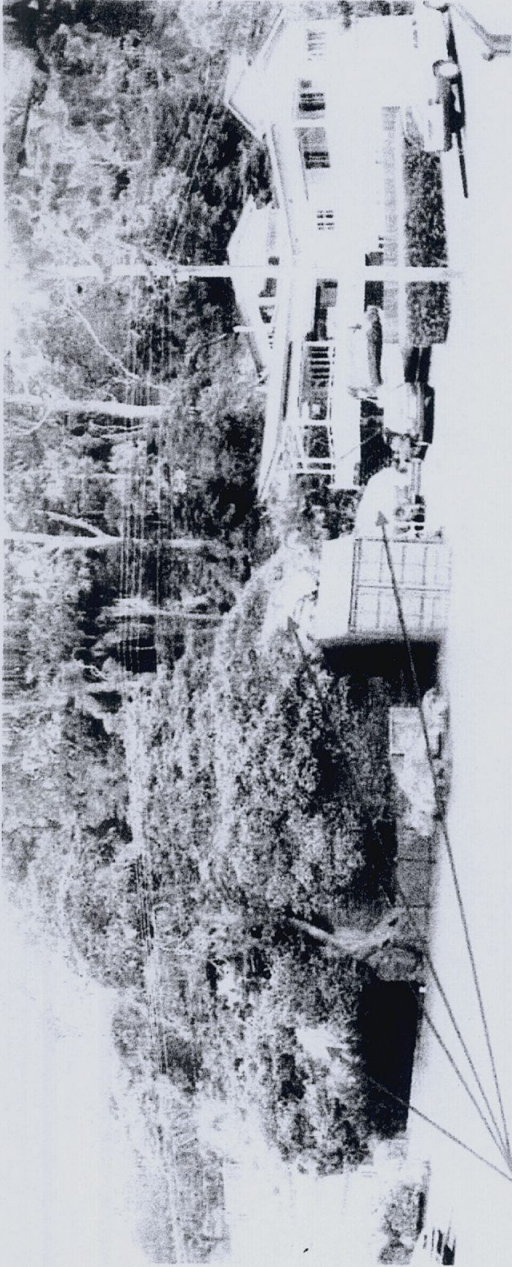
Large sandstone floaters in slope behind residences approximately 150m to the south of the site
